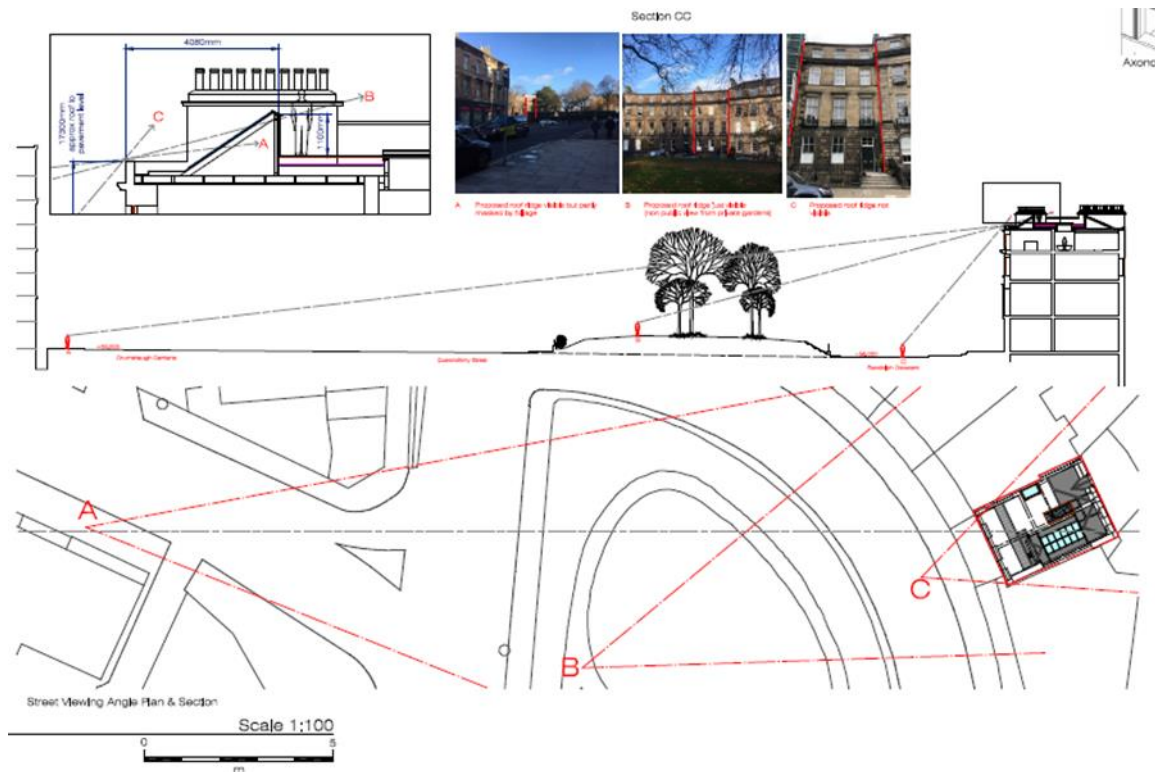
Proposed Sections (Richard Murphy Architects, Drawing No. AL/02/01)
